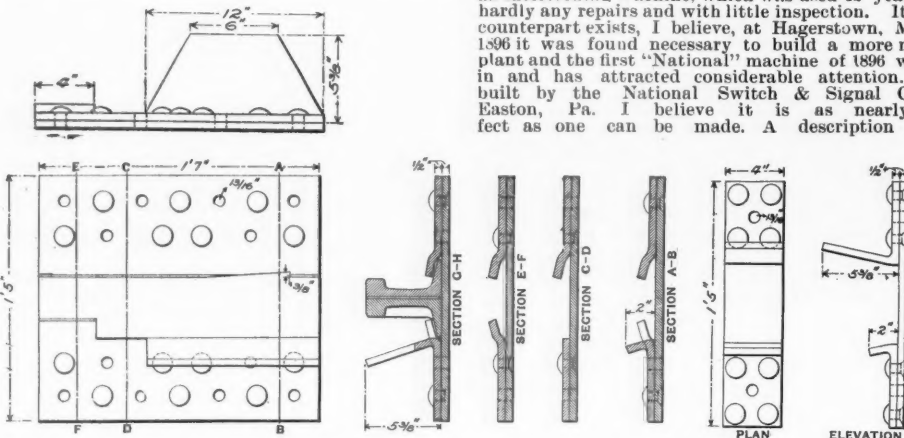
Plans, Elevations and Sections of the Erie's Standard Rail Chairs for Draw Bridges
